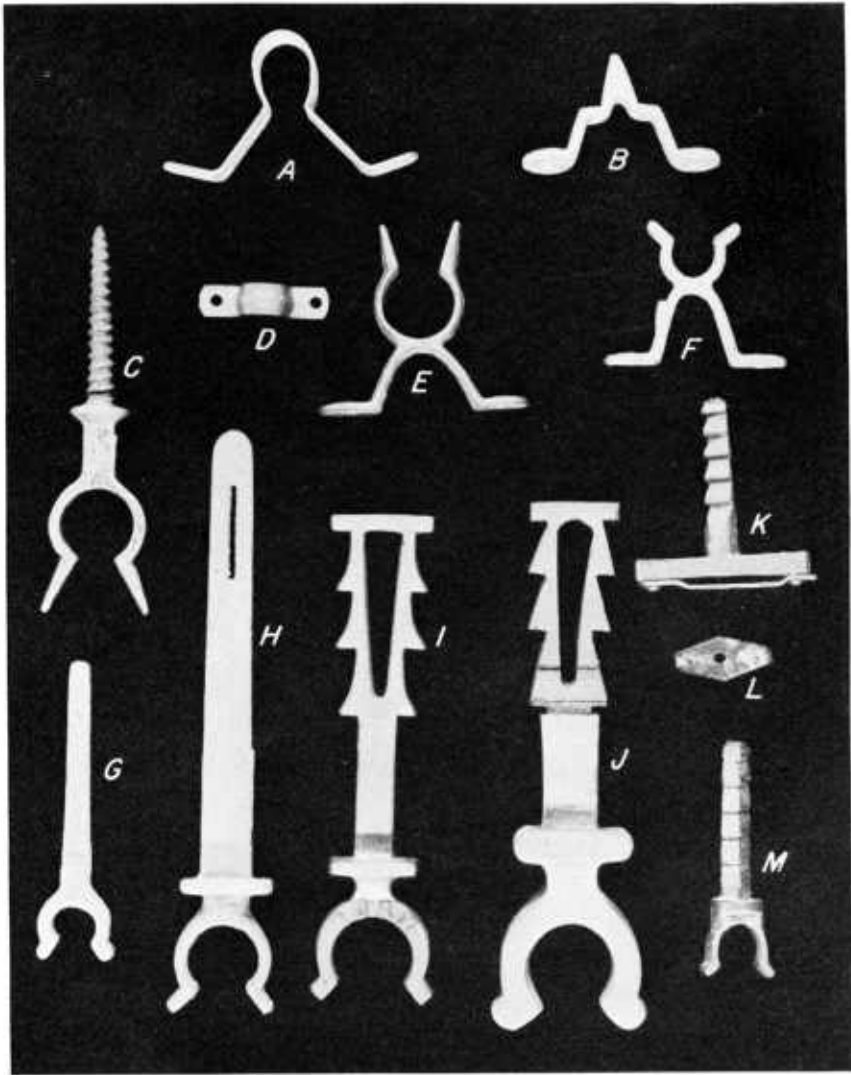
Conductor fasteners: A, Loop fasteners for cable, also used for star-section rod; B, fastener for star-section steel rod laid flat on surface of building; C, screw fastener for cable, also used for star-section rod; D, strap for cable laid flat on surface; E and F, "dispenser" attachments for rod and cable; G, H, I, J, K, and M, various forms of fasteners used with cable and star-section rod adapted to masonry or concrete. J, Chimney fastener coated with lead to protect it from corrosion; and K and L, fasteners used with flat copper cable (fig. 3, E), the latter fastener being secured with copper nails. A, B, D, E, and F, Fasteners usually secured to the surface with galvanized nails (screws would make a better job).
